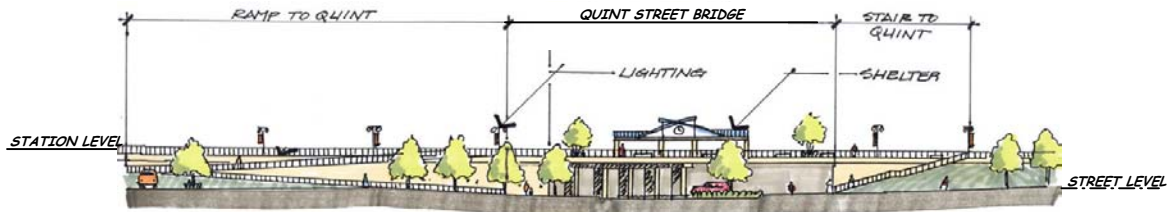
Elevation of station at Quint Street looking toward Jerrold Avenue
